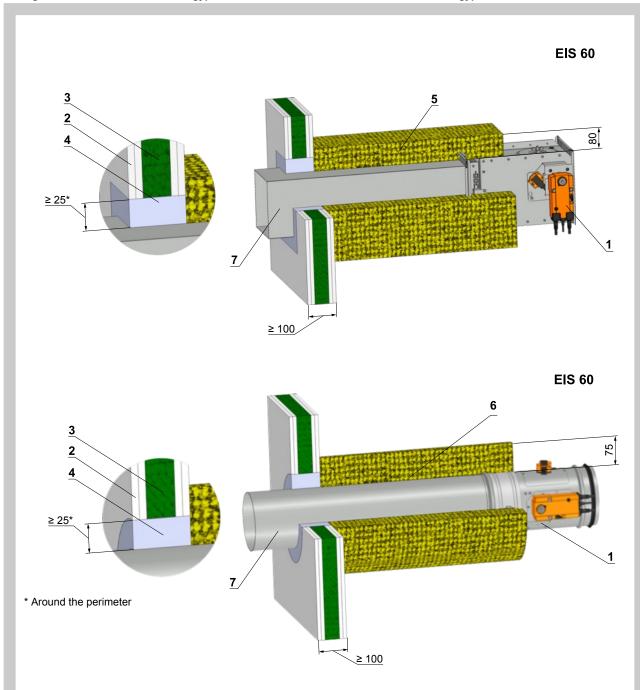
Installation outside of solid wall construction - mineral wool - fire protection mastic
